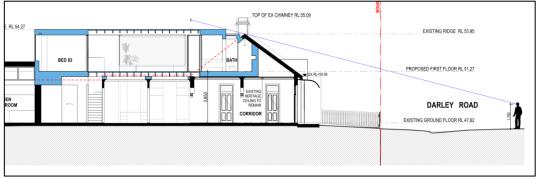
Extract of proposed Section Plan showing impact on the existing roof form (Source: Ahron Best Architects).
